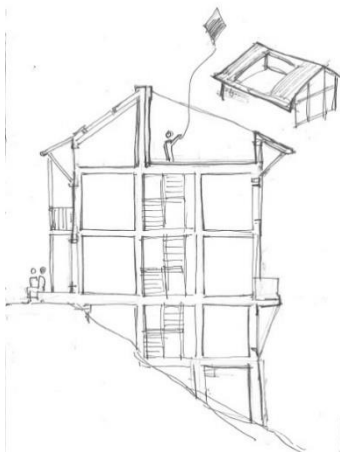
Sketch of roof terrace use (Shock Safe Nepal group 1).
